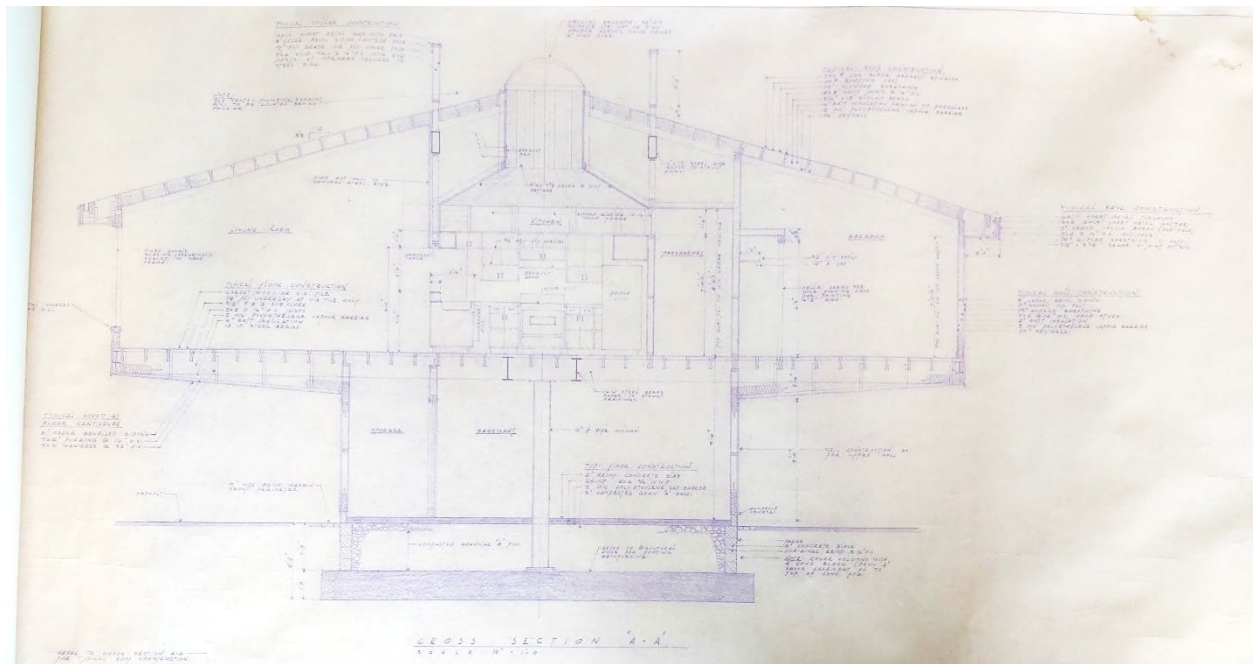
Architectural drawing showing cross-section details, original drawings are in the care of Harry Lennard.
